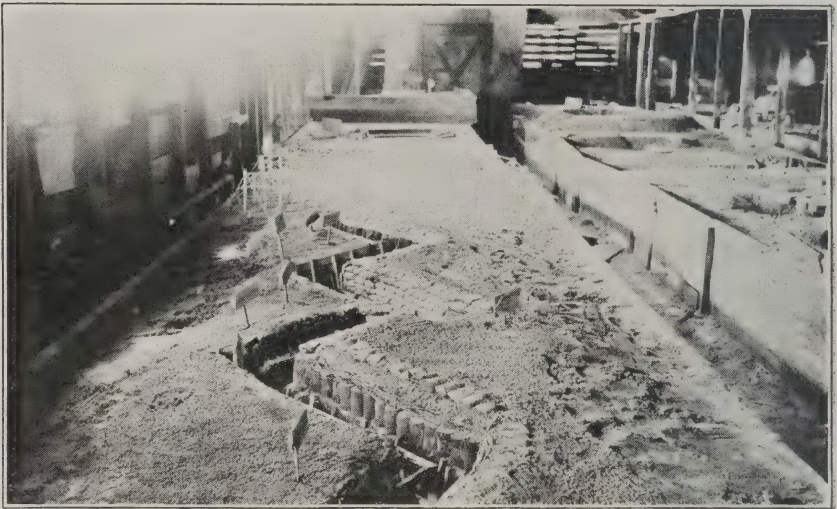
General View of Sand Boxes. Foreground shows trench with different types of revetment.
